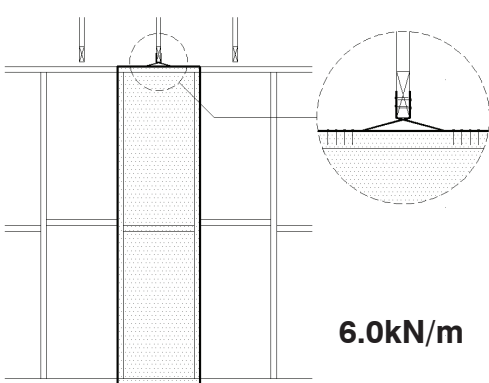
Pryda Shear Connector installed with trusses parallel to the wall frame
